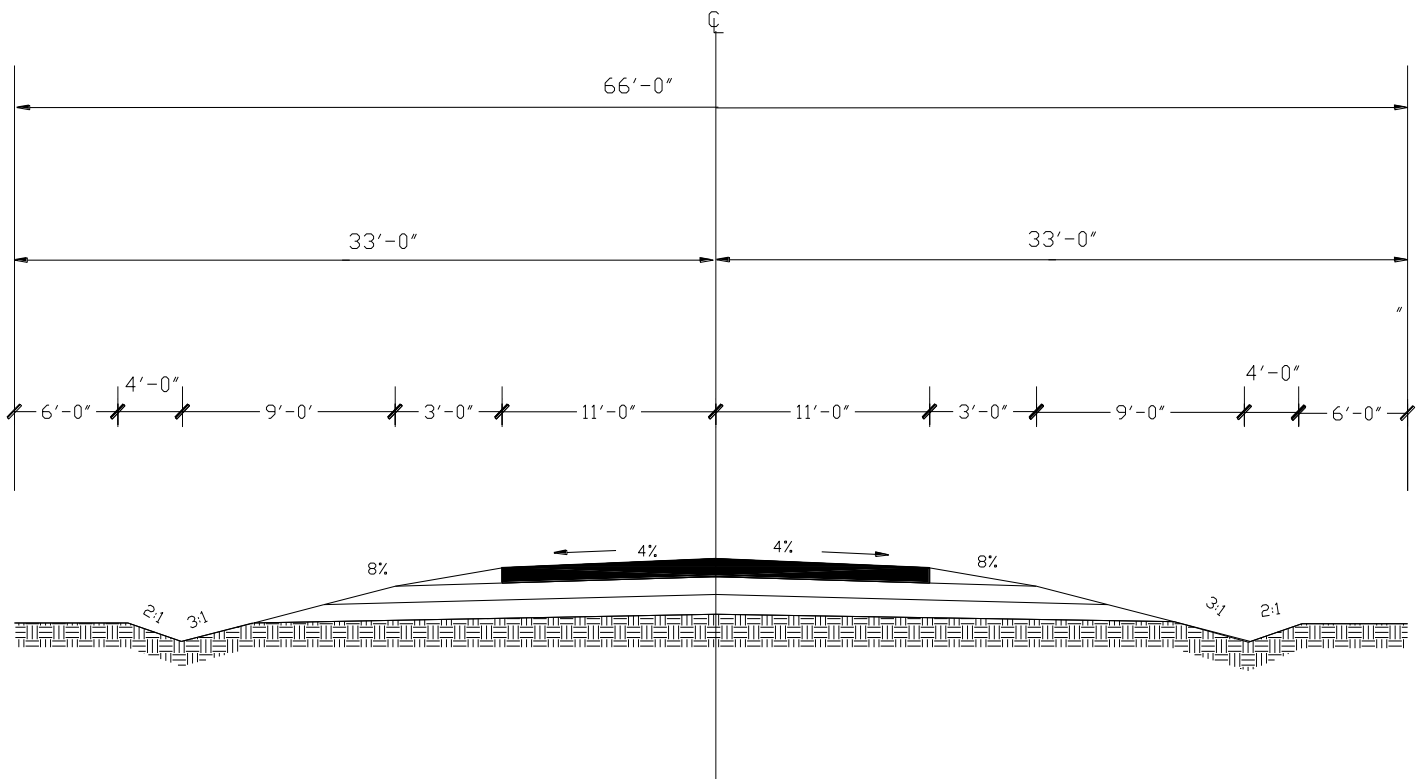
TYPICAL CROSS SECTION OF 66 FEET RIGHT OF WAY
